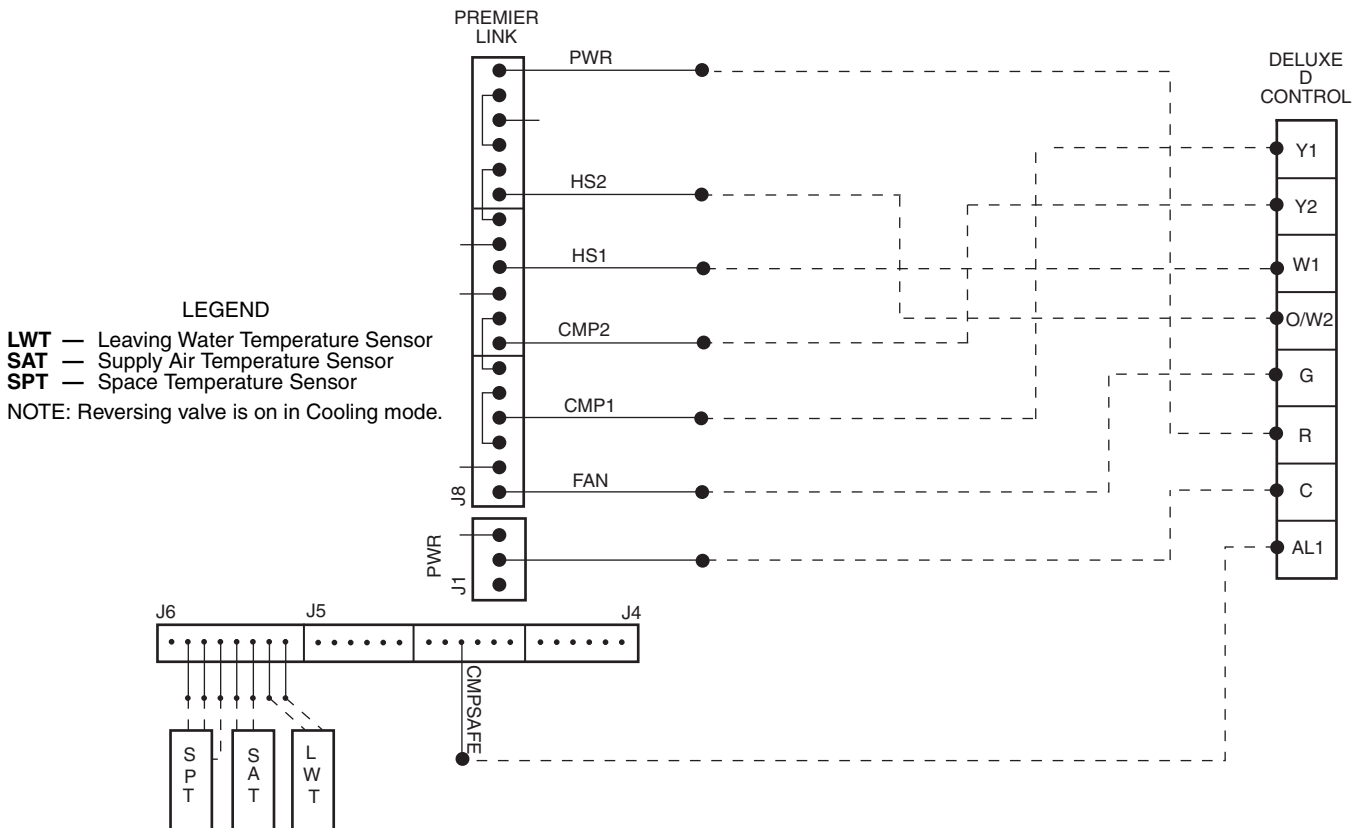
50PEC Unit Remote-Mounted Thermostat with Deluxe D Controller Wiring
